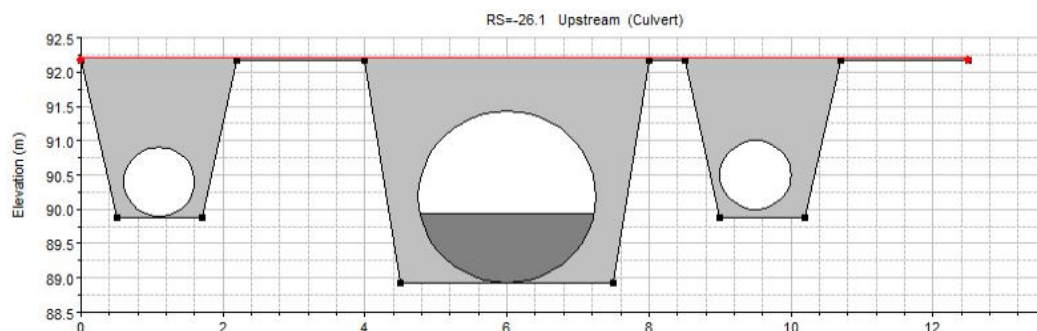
Example of hydraulic structure modelling: Bridge on river Muhe (road NR2)
